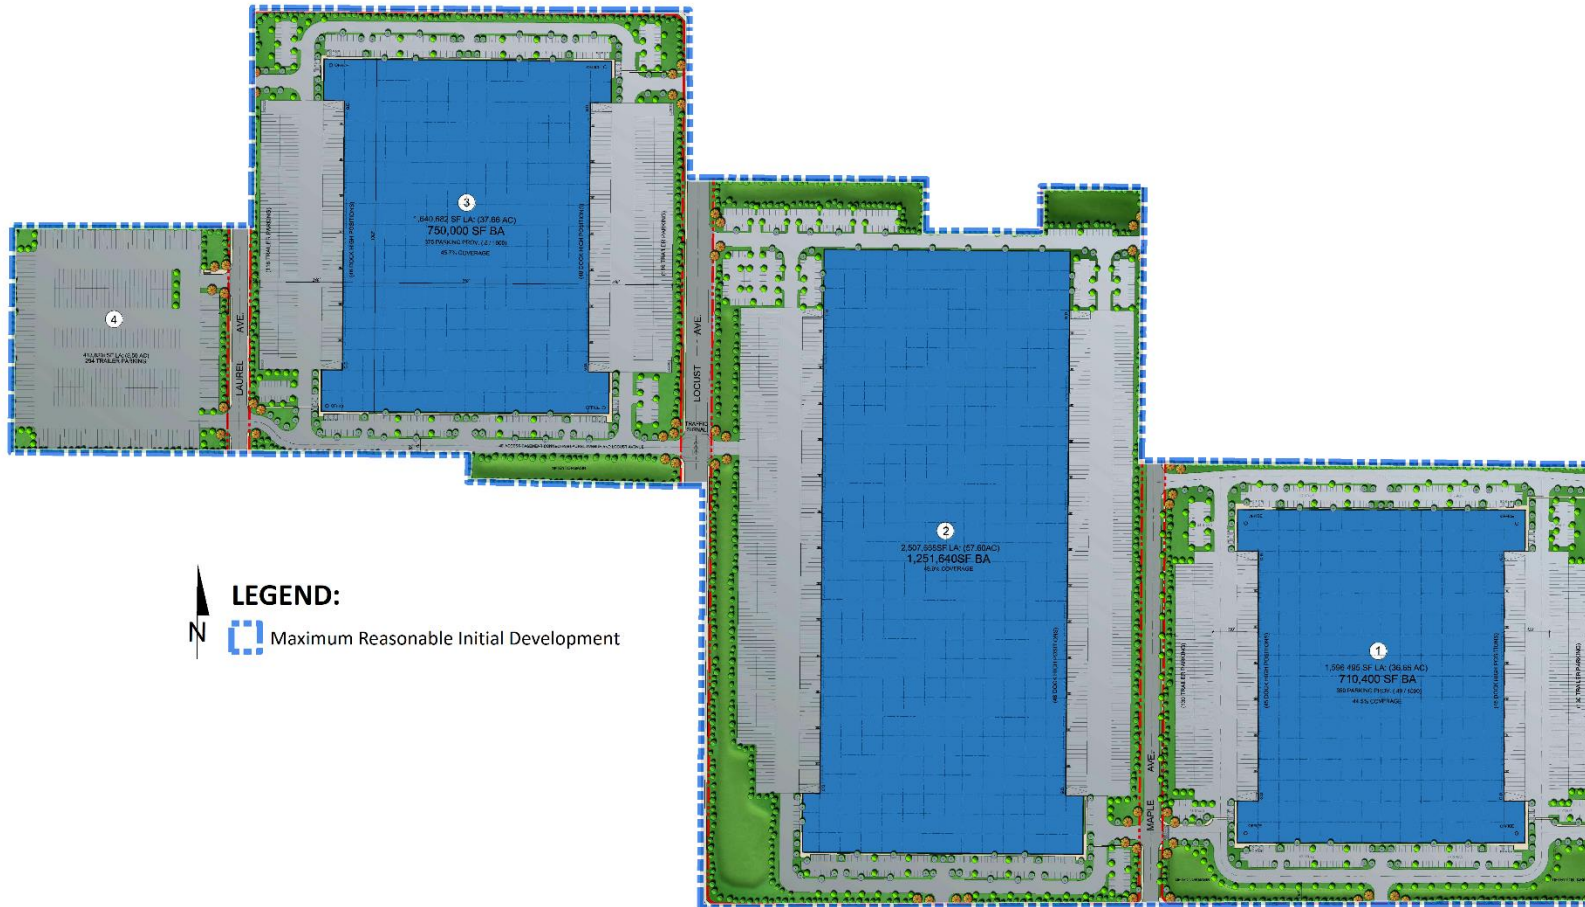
D: SPECIFIC PLAN BUILDOUT (SP) SITE PLAN
